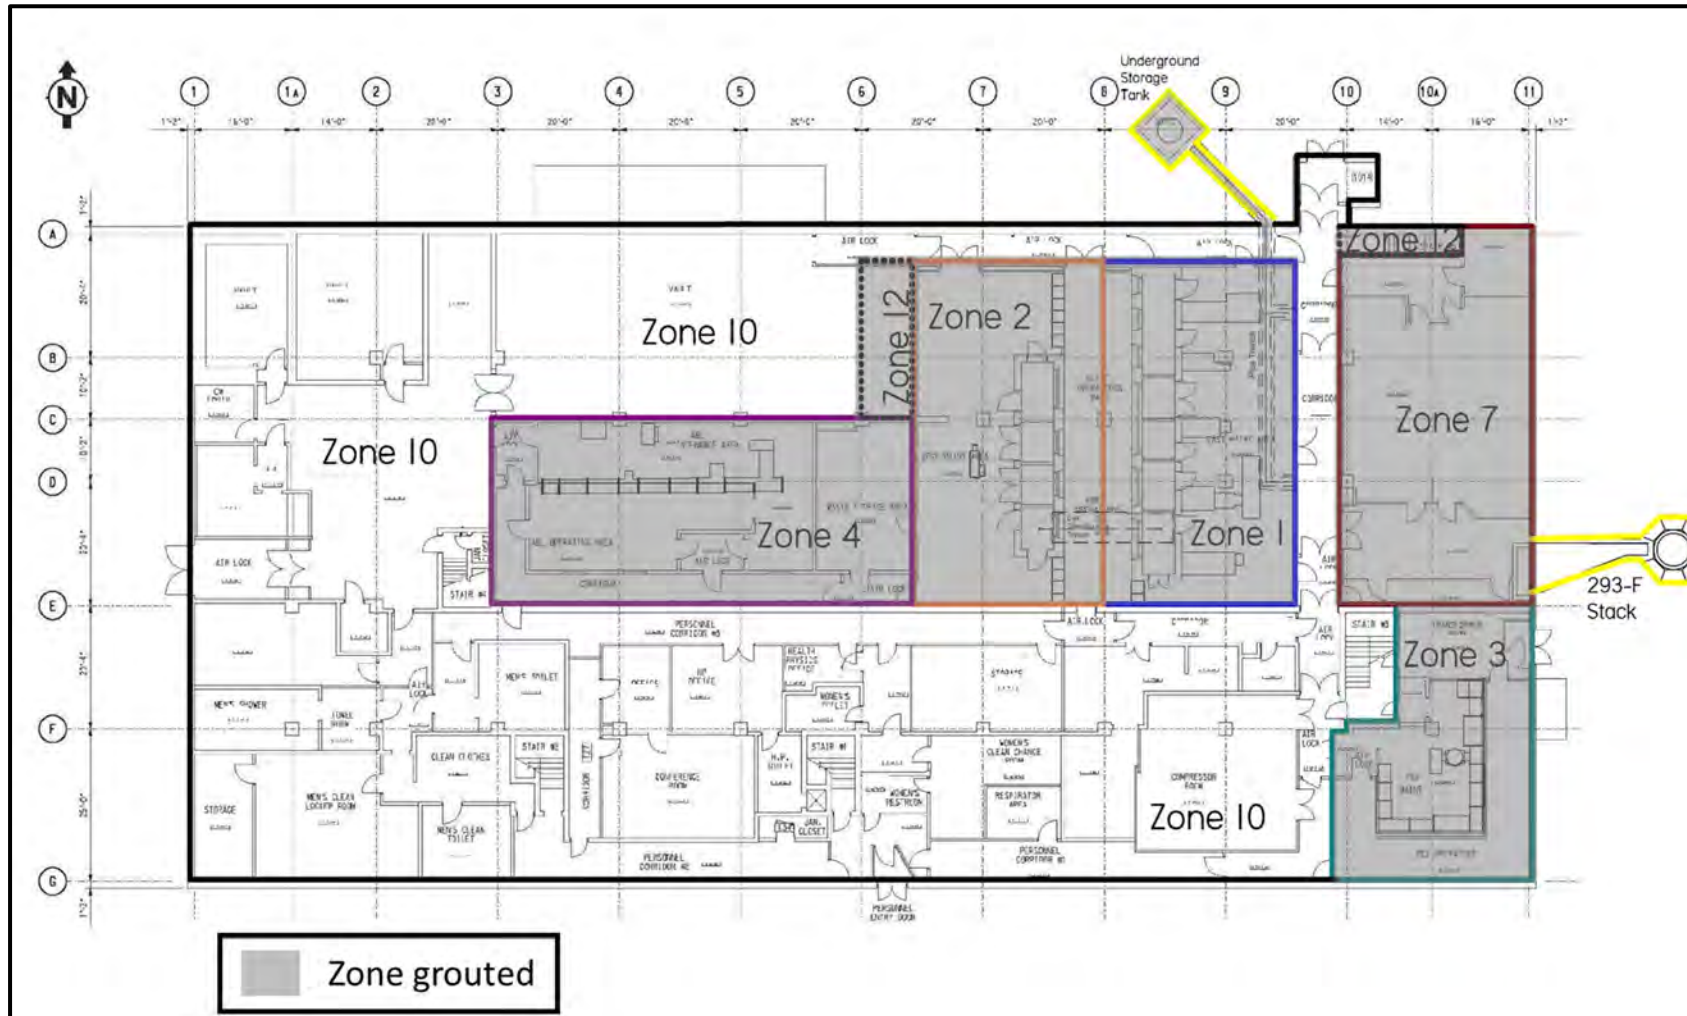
Alternative A-2 – ISD of First and Second Level Process Areas /Engineered Roof (First Level View)
